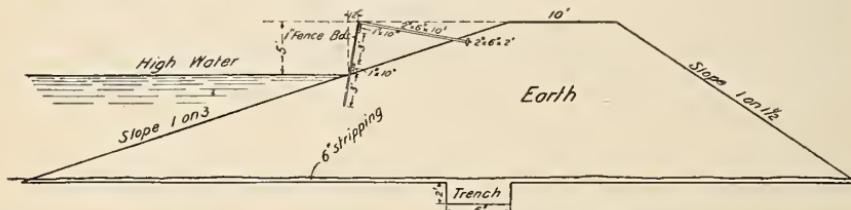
Standard cross section of earth dams of Chicago and Northwestern Railway, showing position of intersecting trench.
